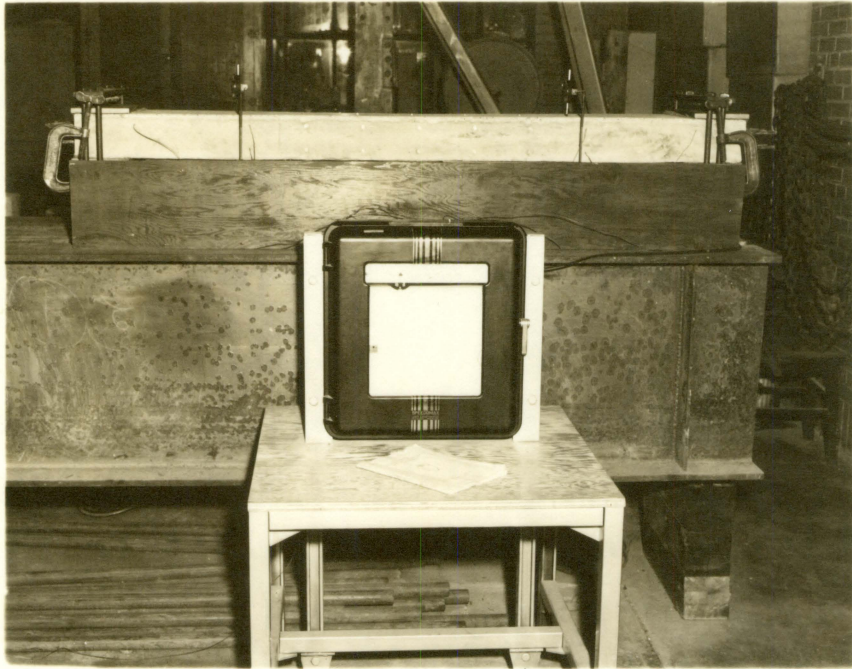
Thermal loading and deflection measuring arrangement for test beams
